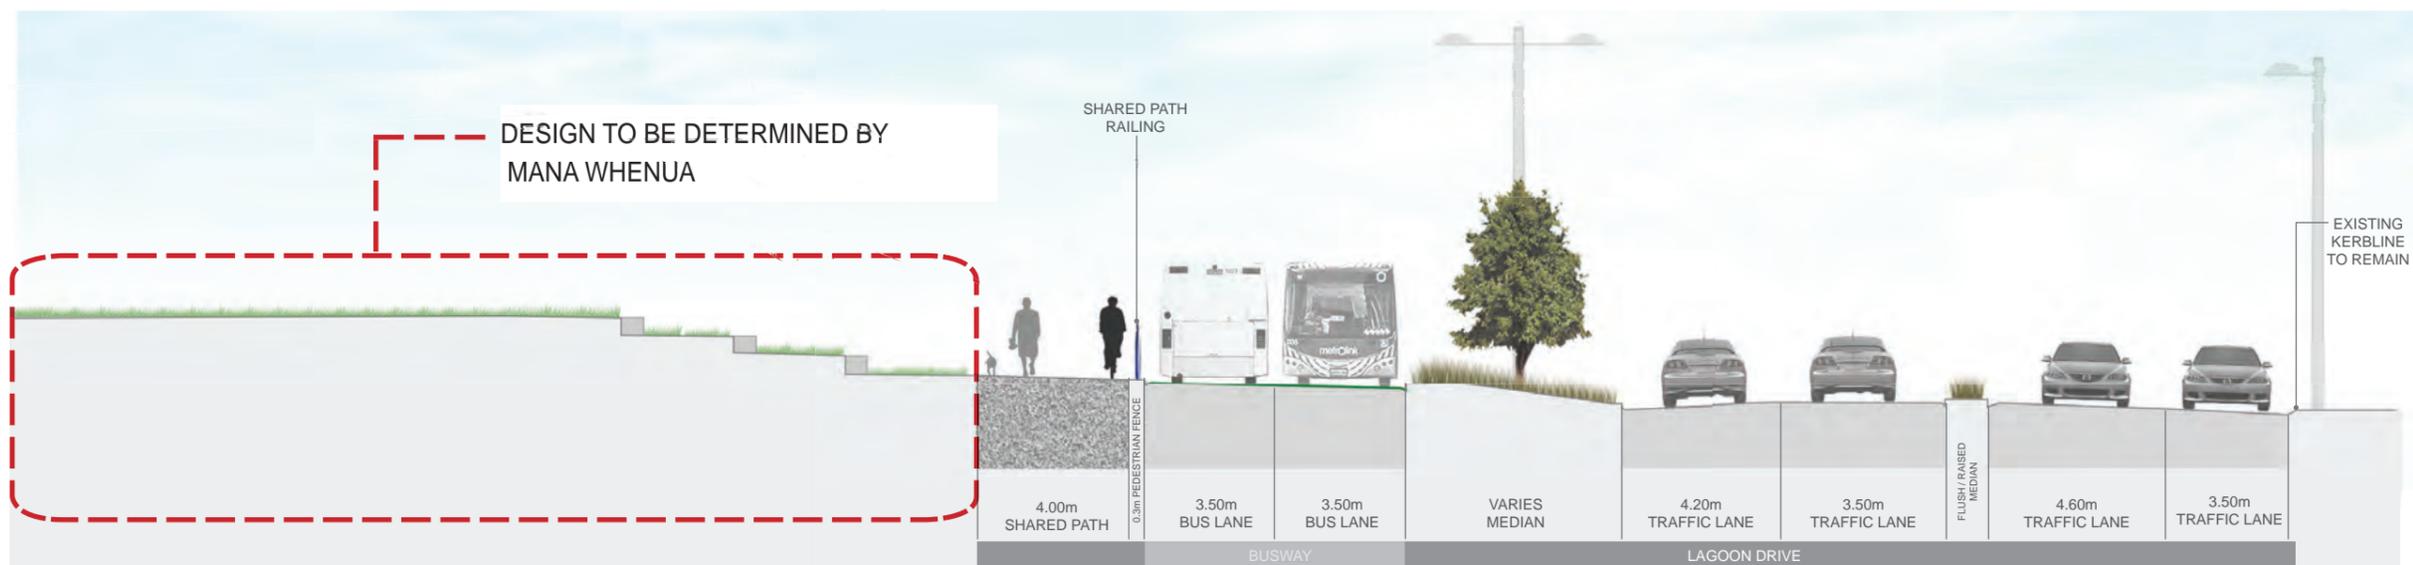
Section G-G through the new terraced park at the Mokoia Pa headland, north-western bridge abutment
